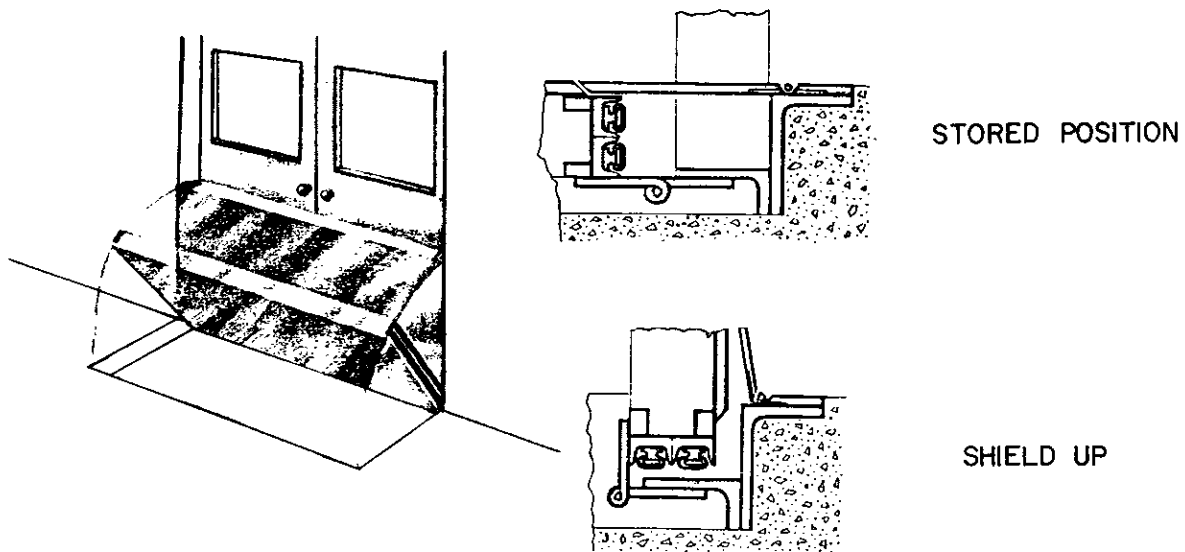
Door flood shield and sealing mechanism storage in floor. (Reference 32)
